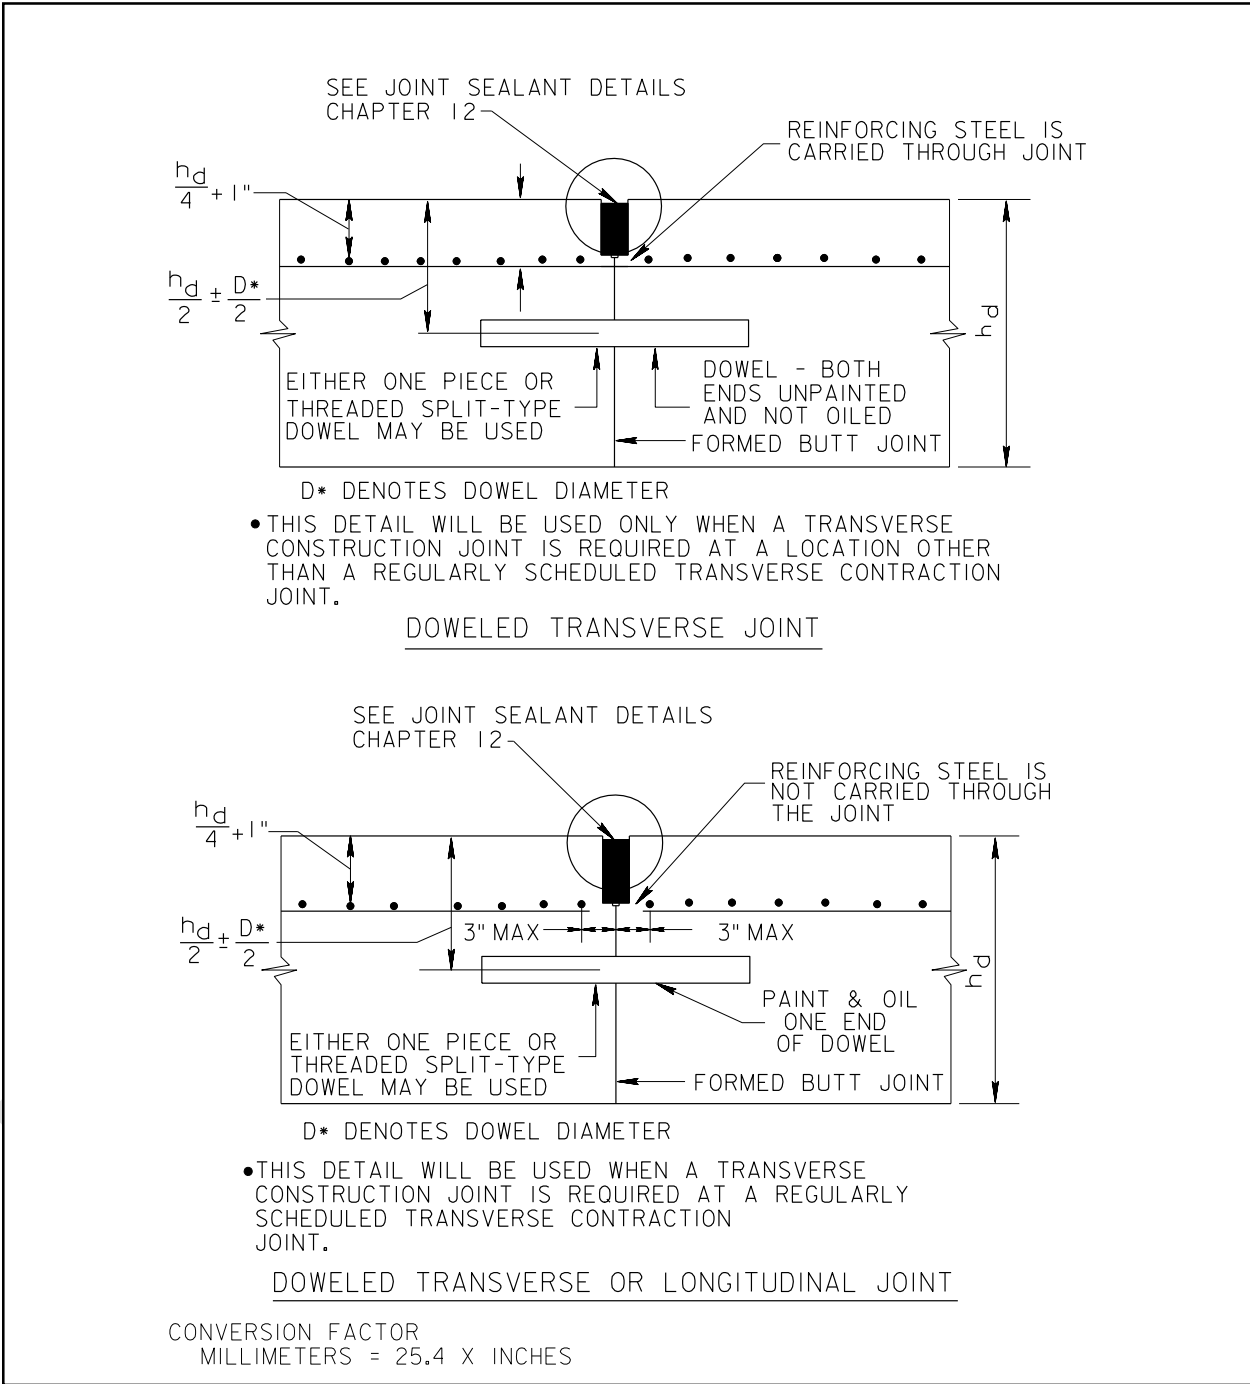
Reinforcing Steel Cross Section Details
